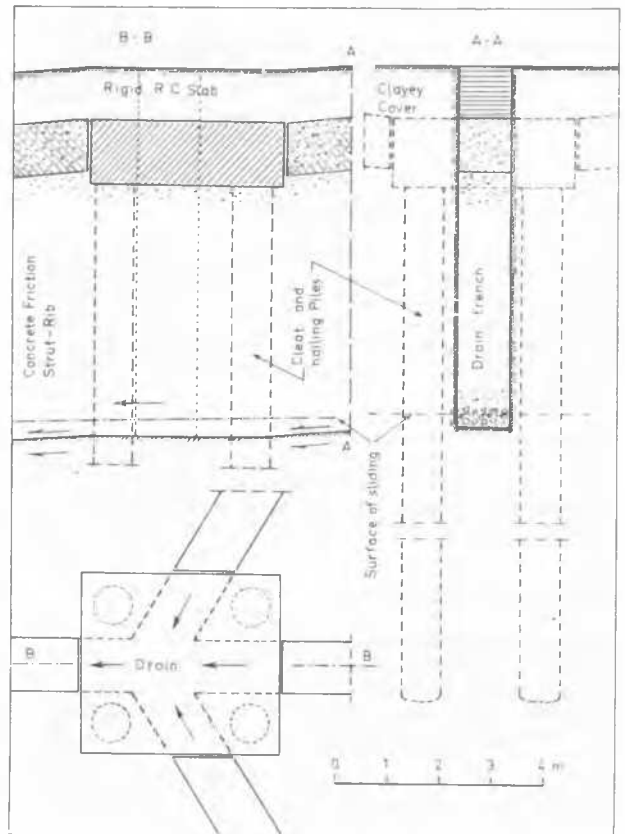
Detail of the drain trenches and the cap of the cleft and nailing piles.
